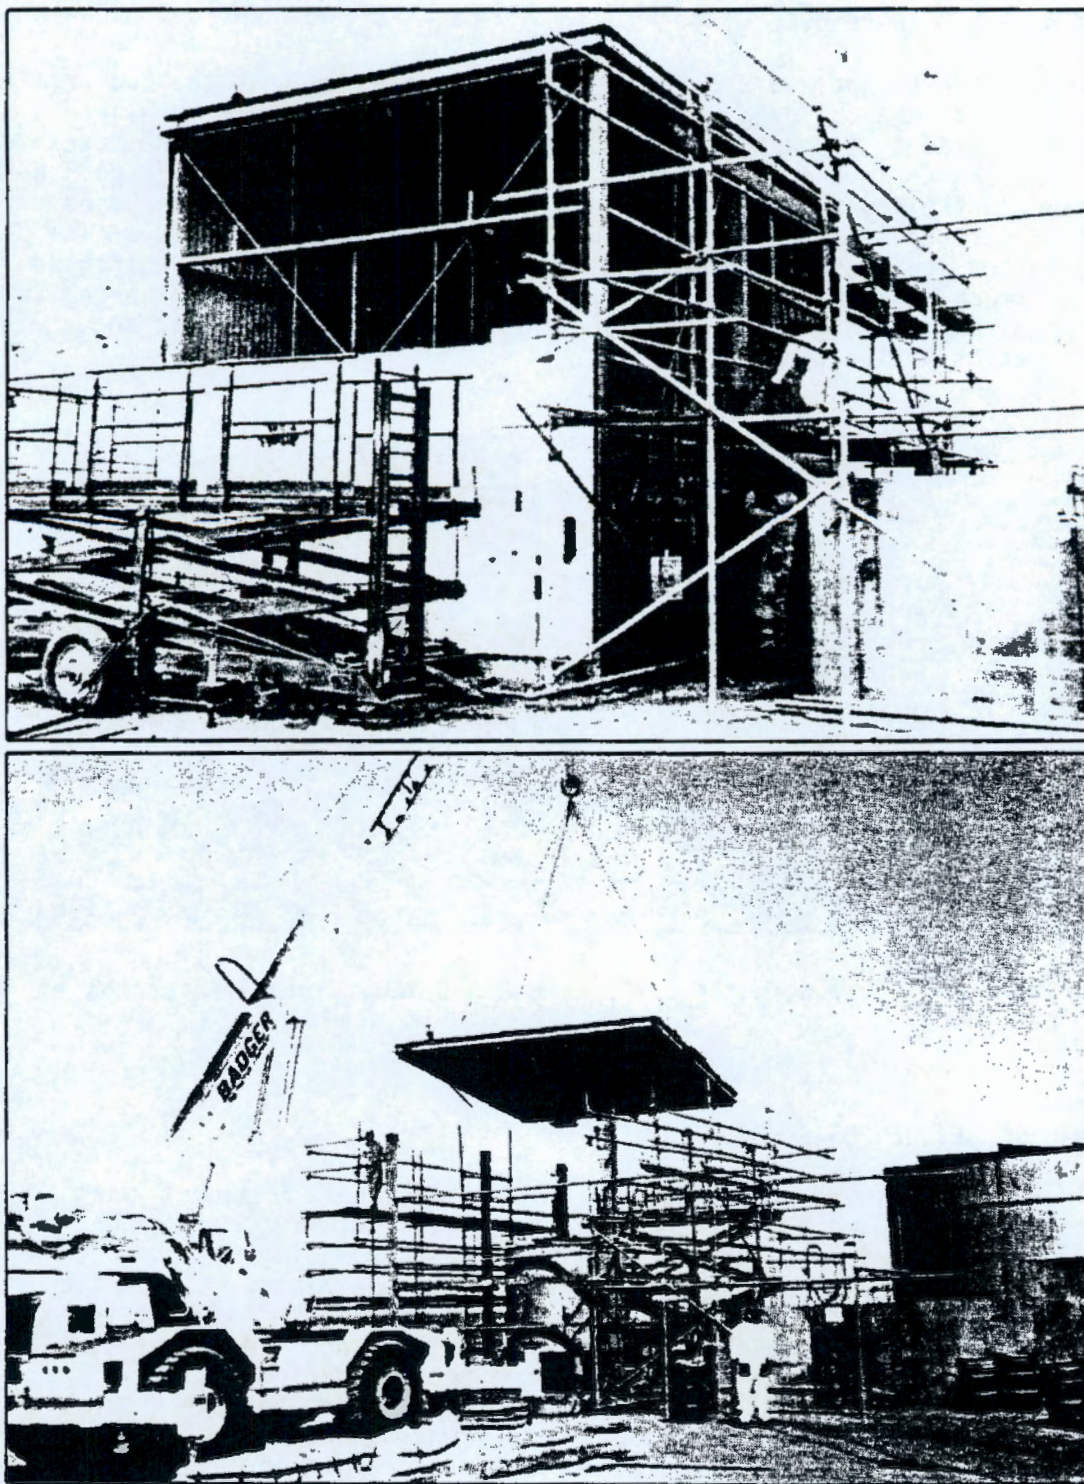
Removing Asebestos-Cement Siding Panels and Roof from the 205-S Building.
